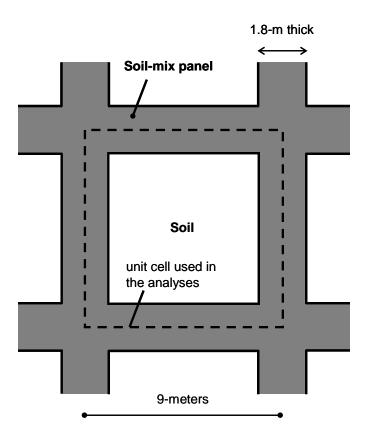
Plan view of soil-mix panel improvement, 1.8-m thick soil-mix panels at 9 m center-to-center spacing (Replacement Ratio = 36%)
